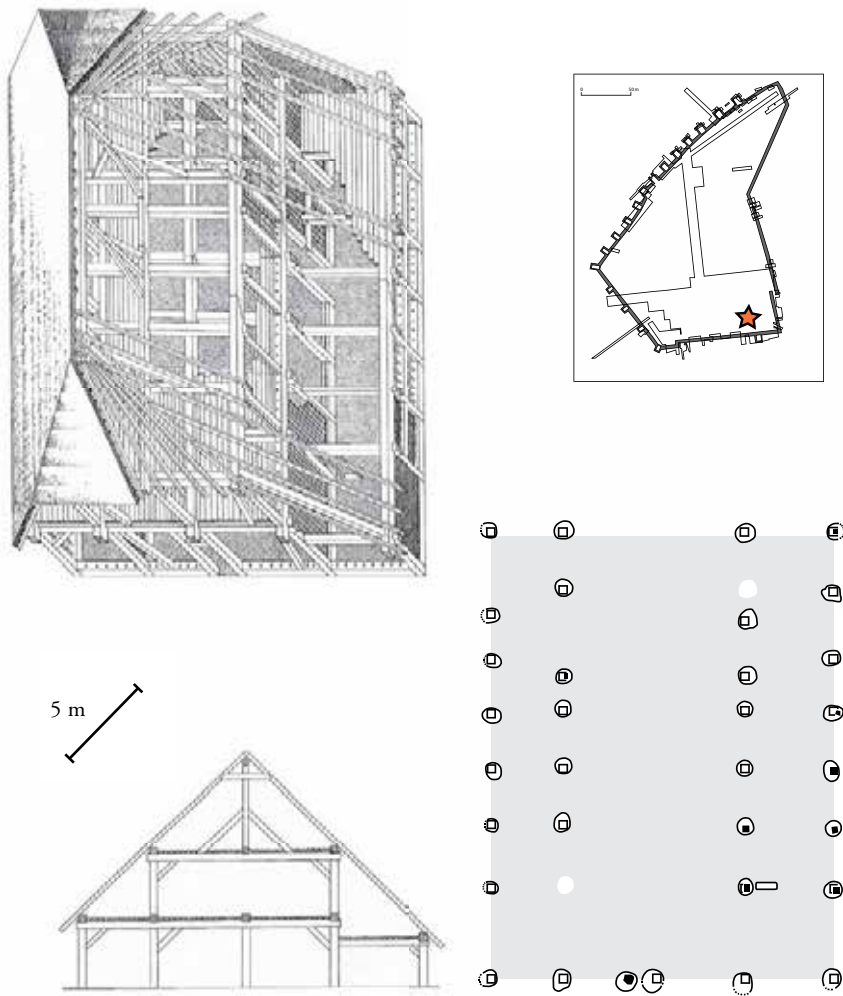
Building plan and architectural reconstruction in the Citadel of Heuneburg for period II-Ha D3 (530-480 BC) (Baden-Württemberg-Germany). After Gersbach 1996. Illustration: E. Dubreucq.
